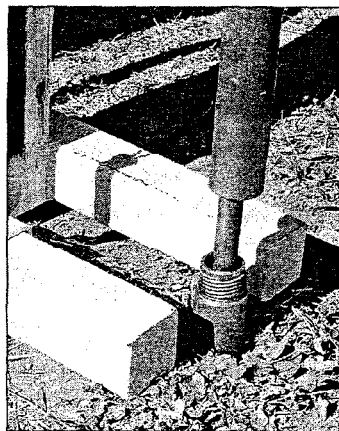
Place a 2.125-inch probe rod over the 1.0-inch probe rod and thread it onto the outer casing string.
